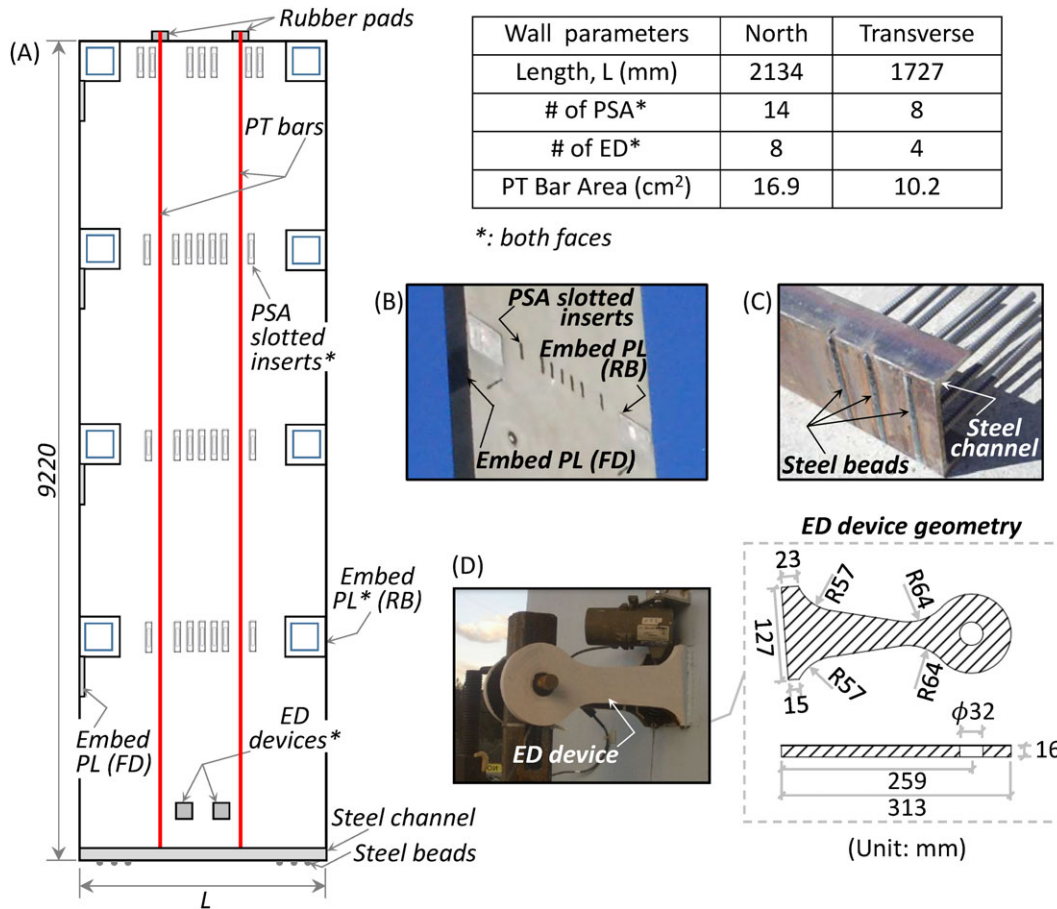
North wall detail: A, wall; B, embedded plates; C, steel channel; D, ED device [Colour figure can be viewed at wileyonlinelibrary.com]
